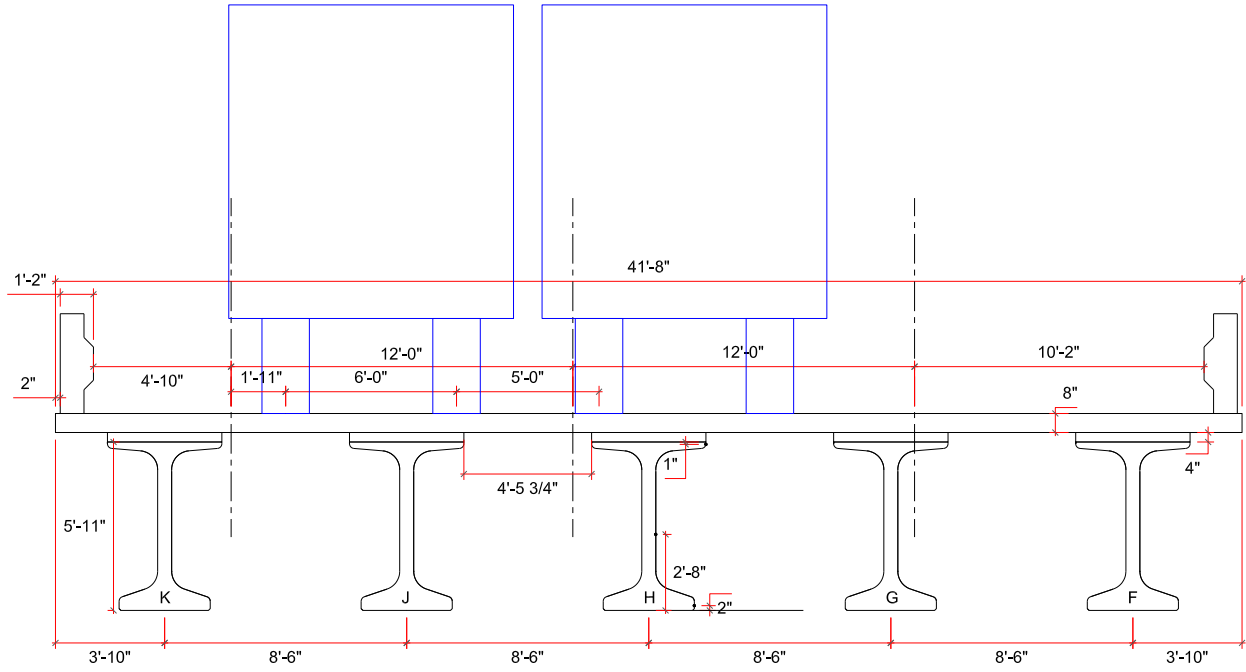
Instrumentation of bridge superstructure of CIP concrete deck
